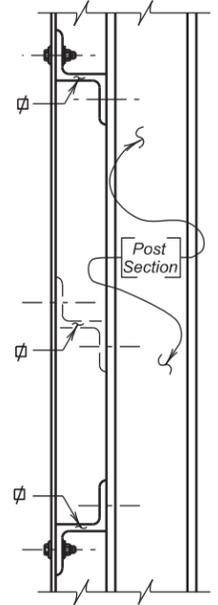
DETAILS FOR MOUNTING SHEET ALUMINUM SIGNS ON STEEL FLANGED POSTS
